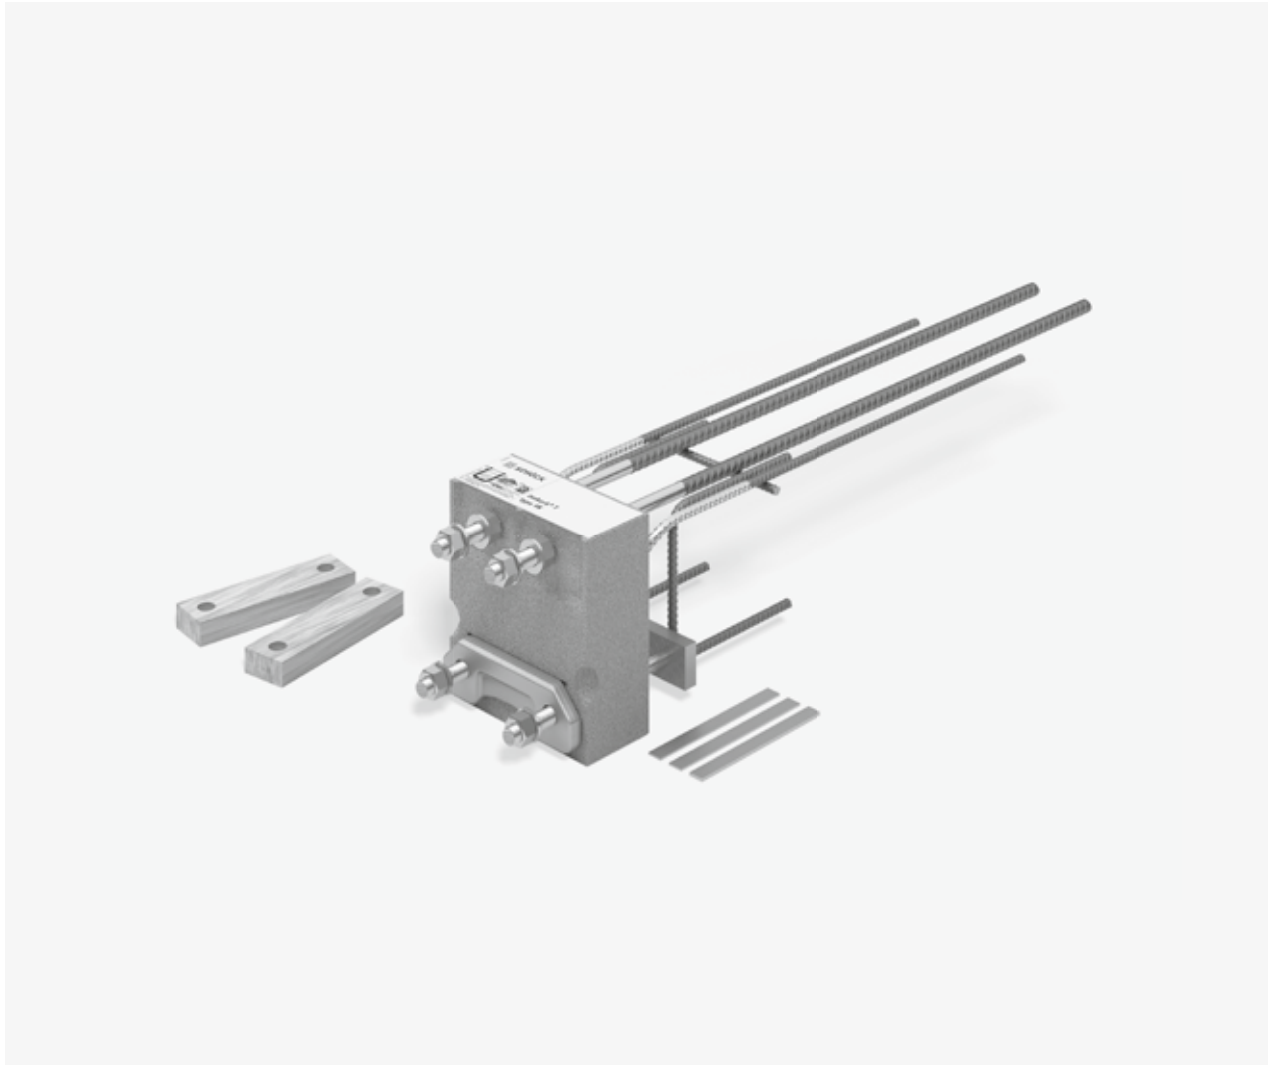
Schöck Isokorb® T type SK: Cantilever fin connection with stub bracket enables tolerances in vertical and horizontal directions to help overcome dimensional deviations of the reinforced concrete structure; spacer shims are included with the Isokorb®
